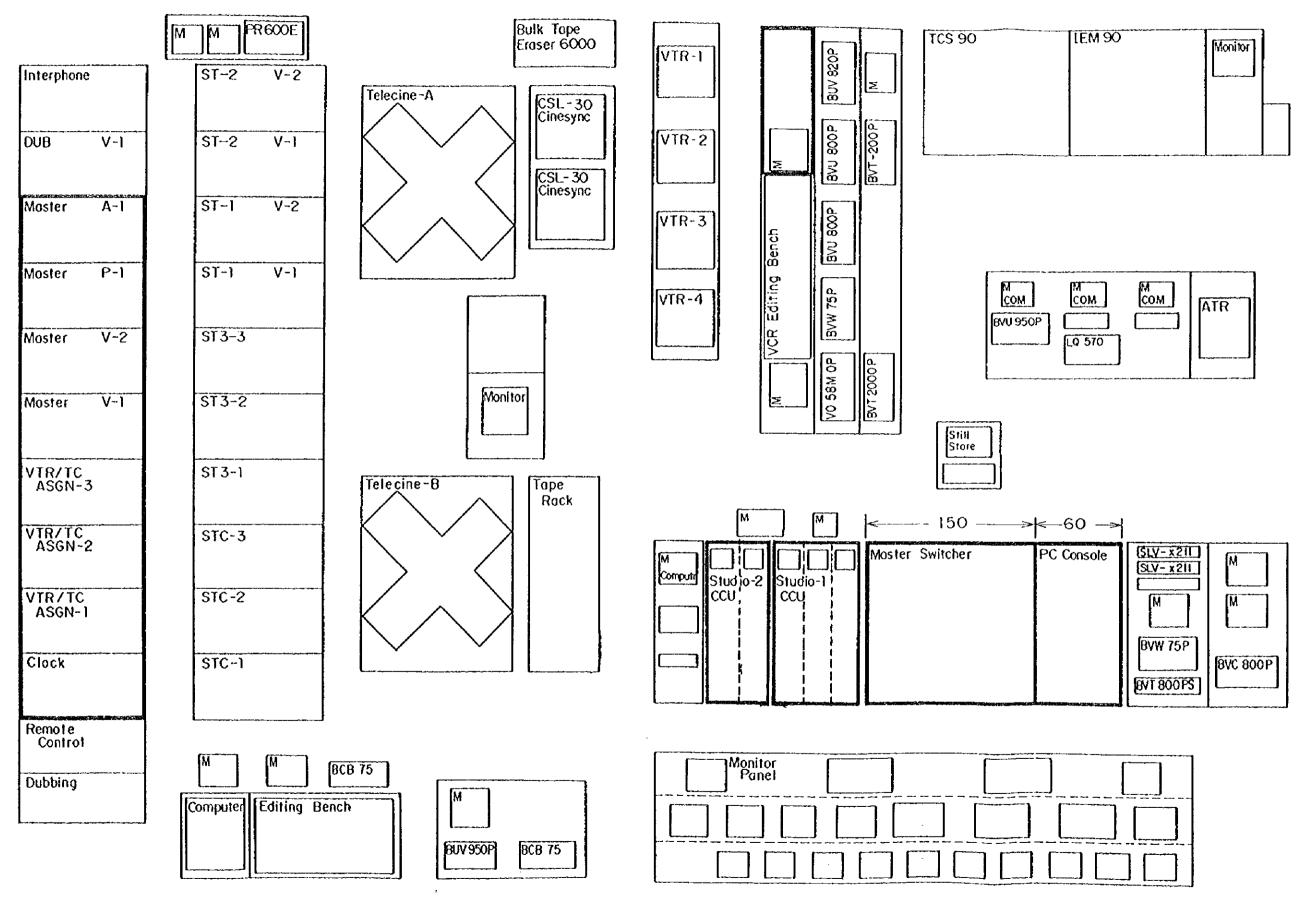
Floor layout of Master Control Room in Colombo Studio Center
